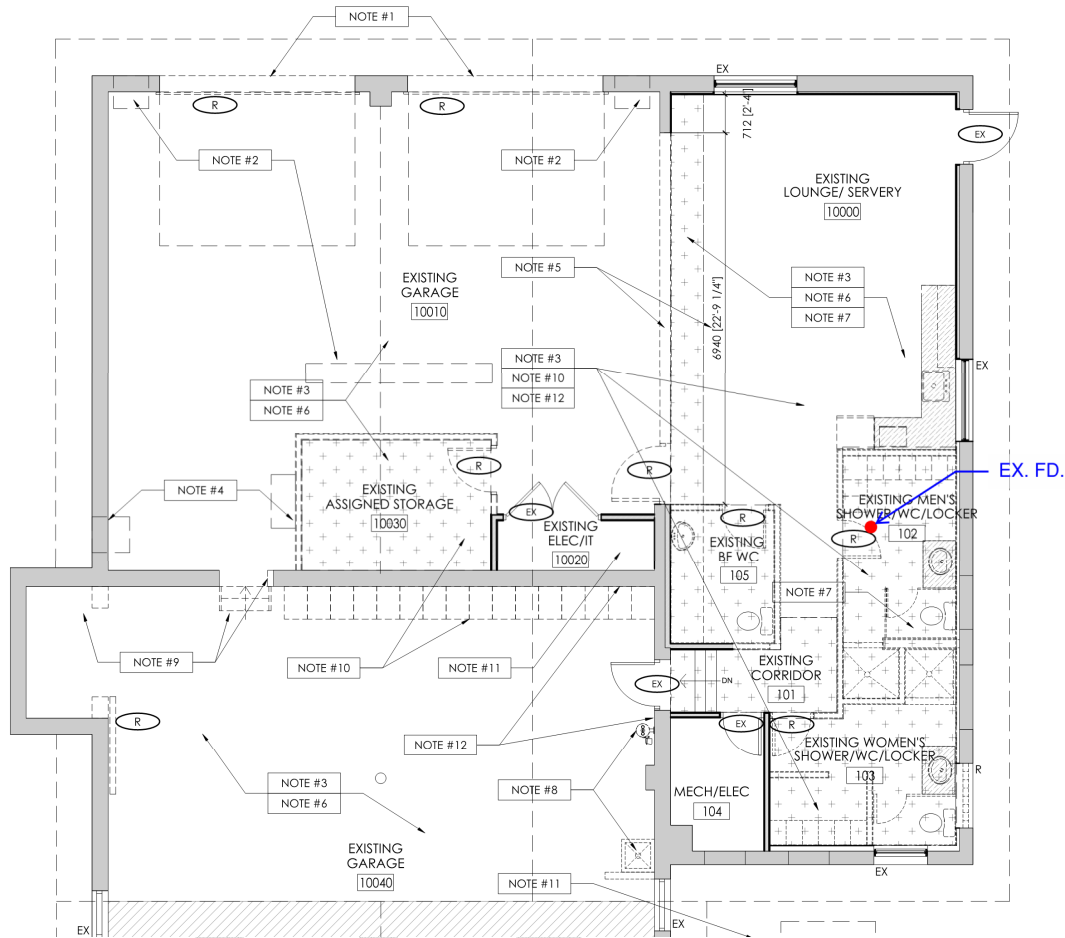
Partial floor plan showing CCTV Inspection starting point EX. FD.
